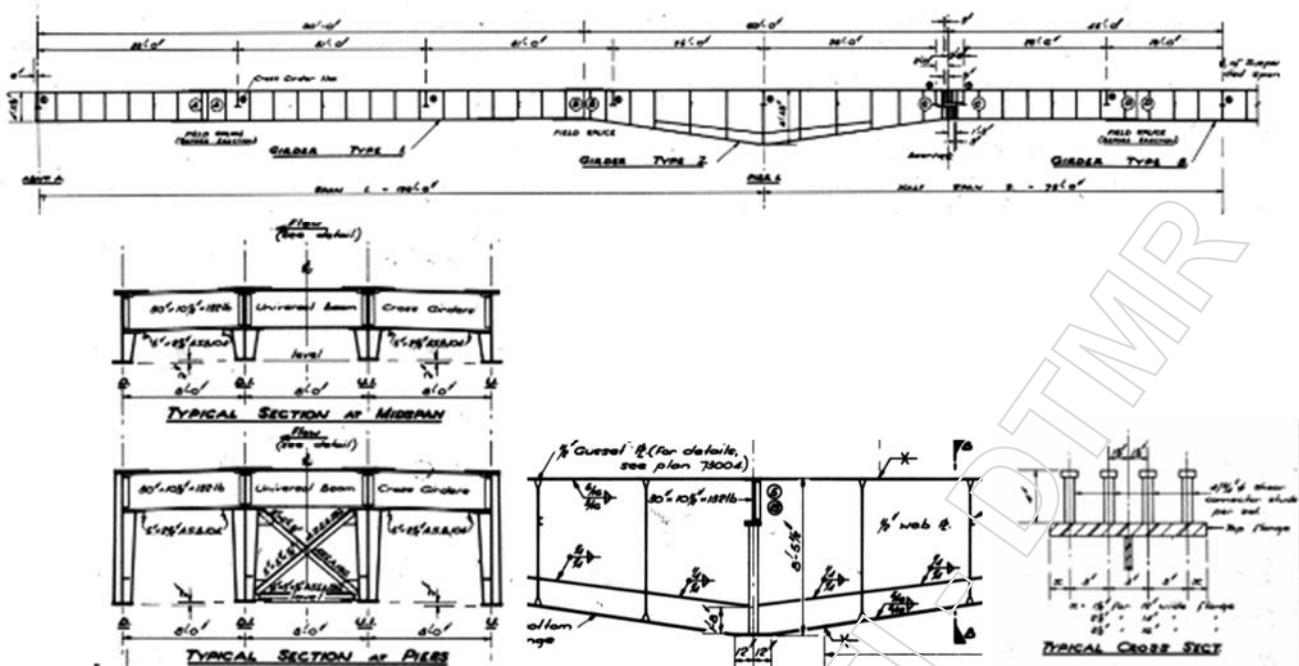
Overview of girders. Note haunch at piers, stiffened webs, drop-in spans and shear studs
